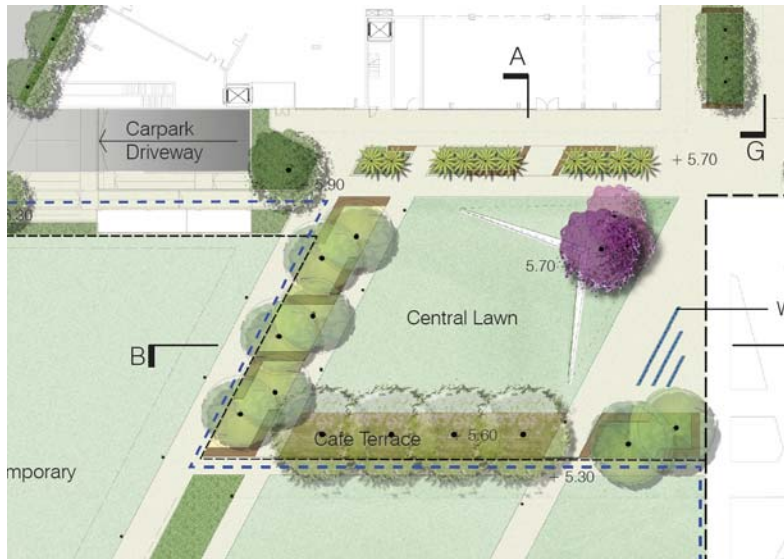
Extract of approved landscape plan for Neighbourhood Park
